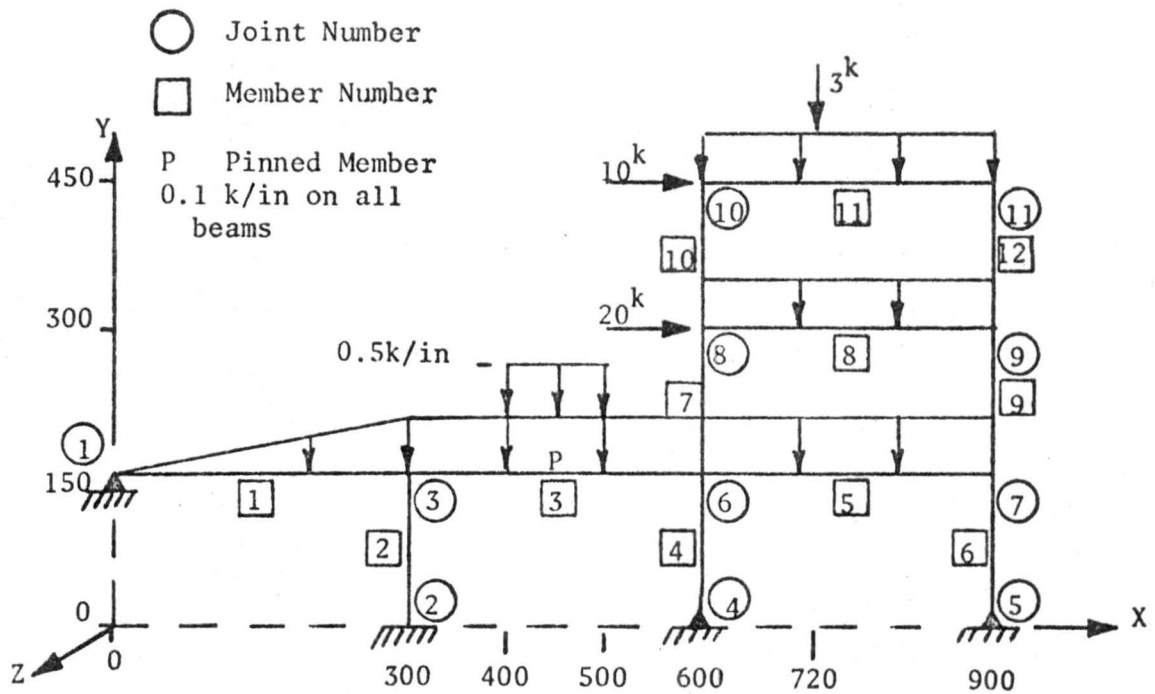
Plane frame with structural coordinate system, joint numbering and loads. All units are kips and inches.
